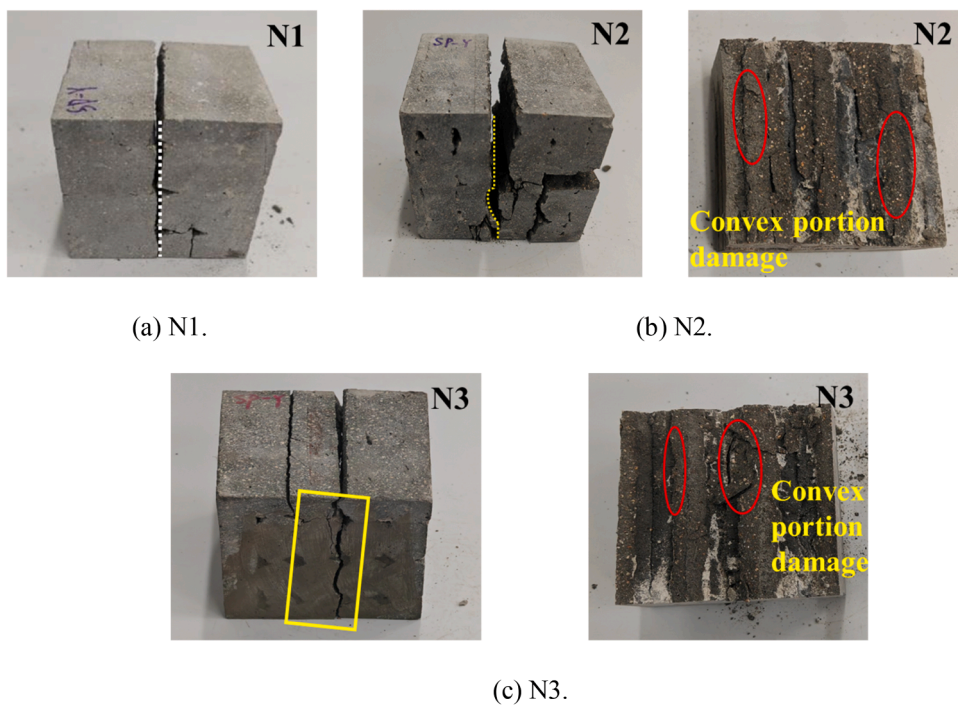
Failure mode of 3D printed concrete specimens (Y direction).
